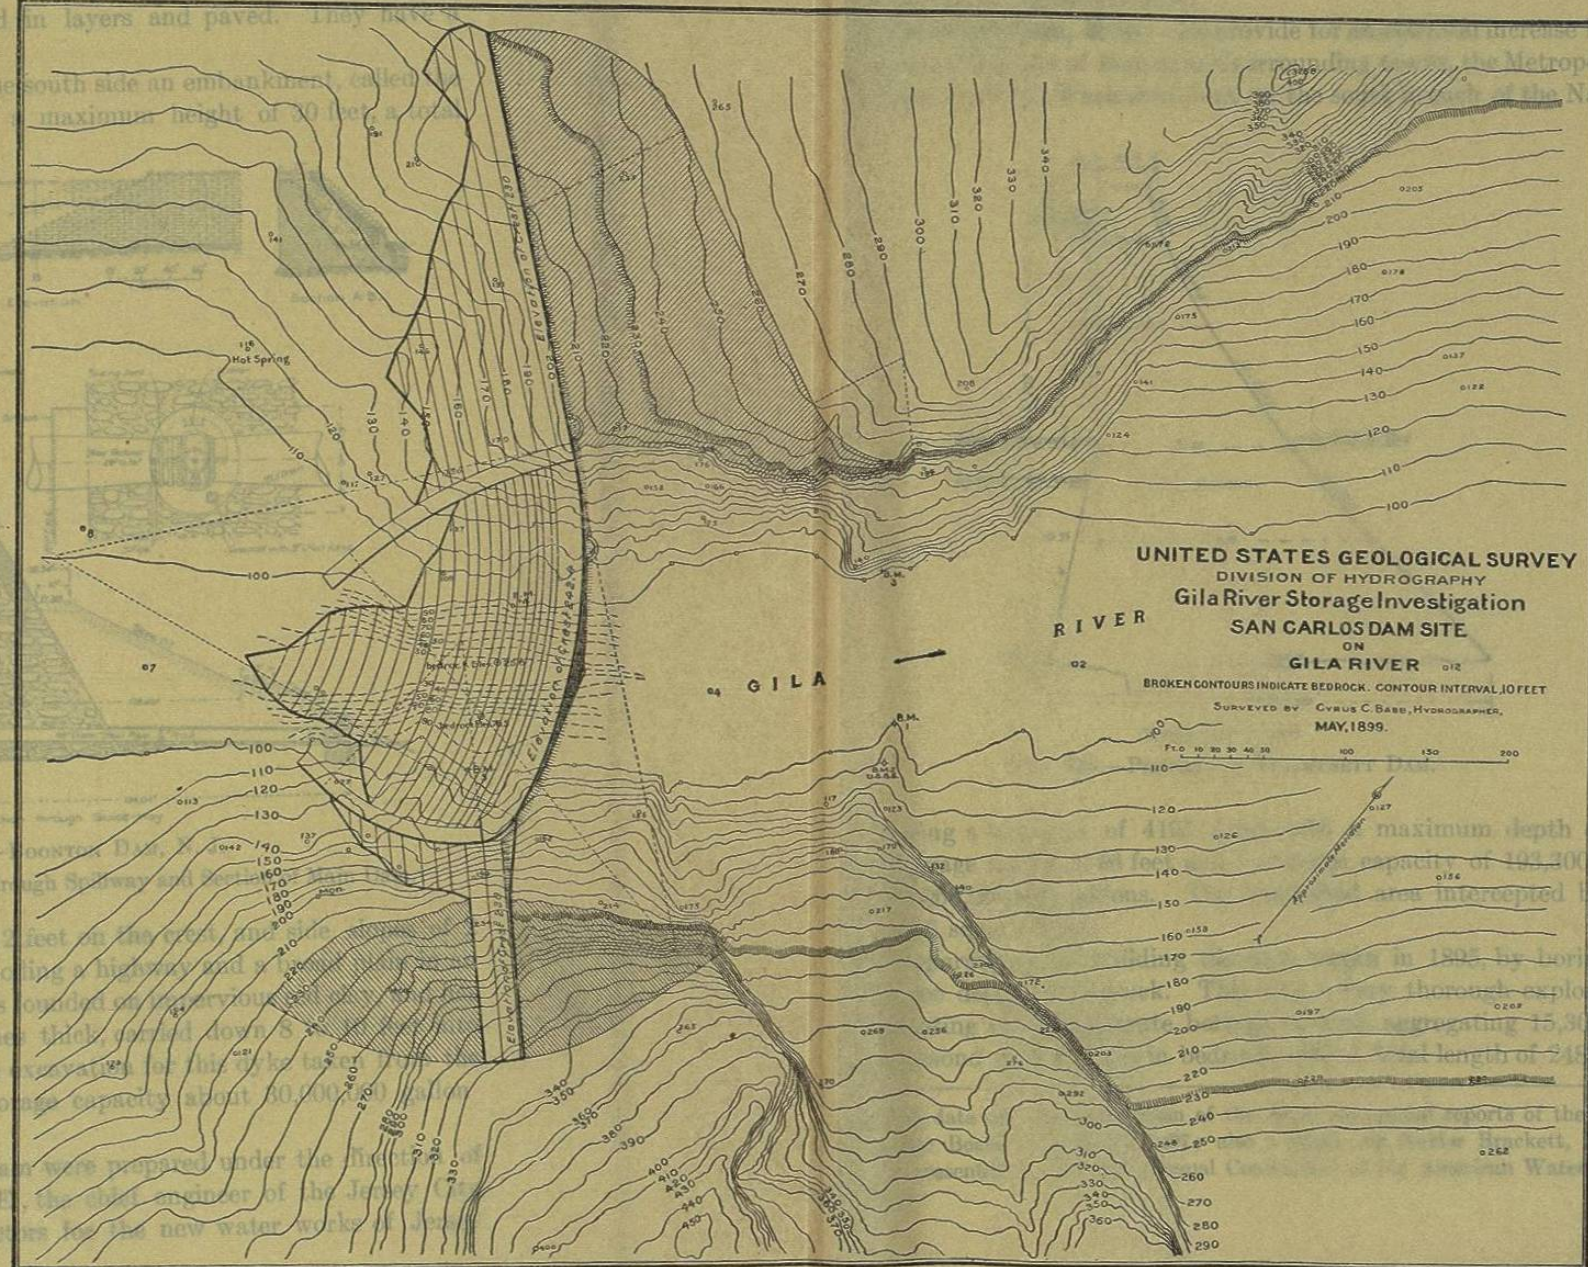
CONTOUR PLAN OF SAN CARLOS DAM-SITE, SHOWING LOCATION SELECTED FOR PROPOSED MASONRY DAM.
